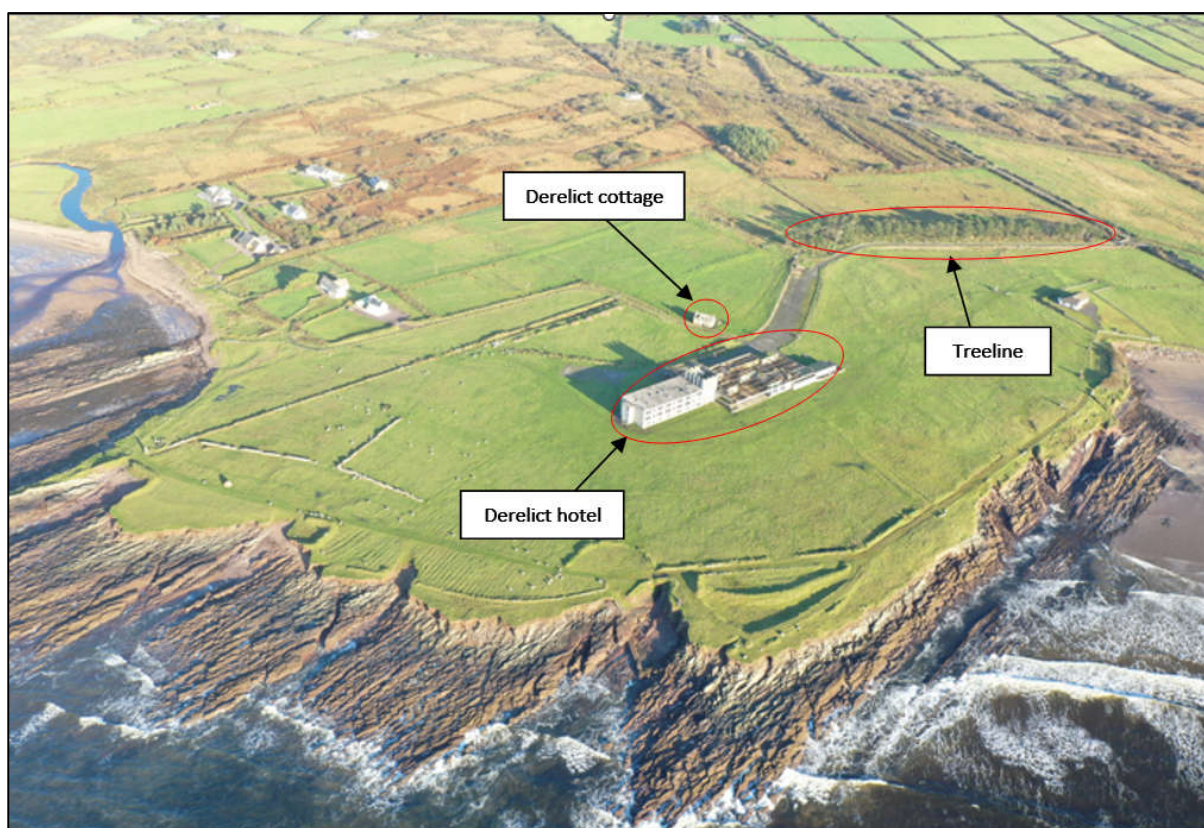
Drone image of proposed development site and general surrounding area showing existing site features
